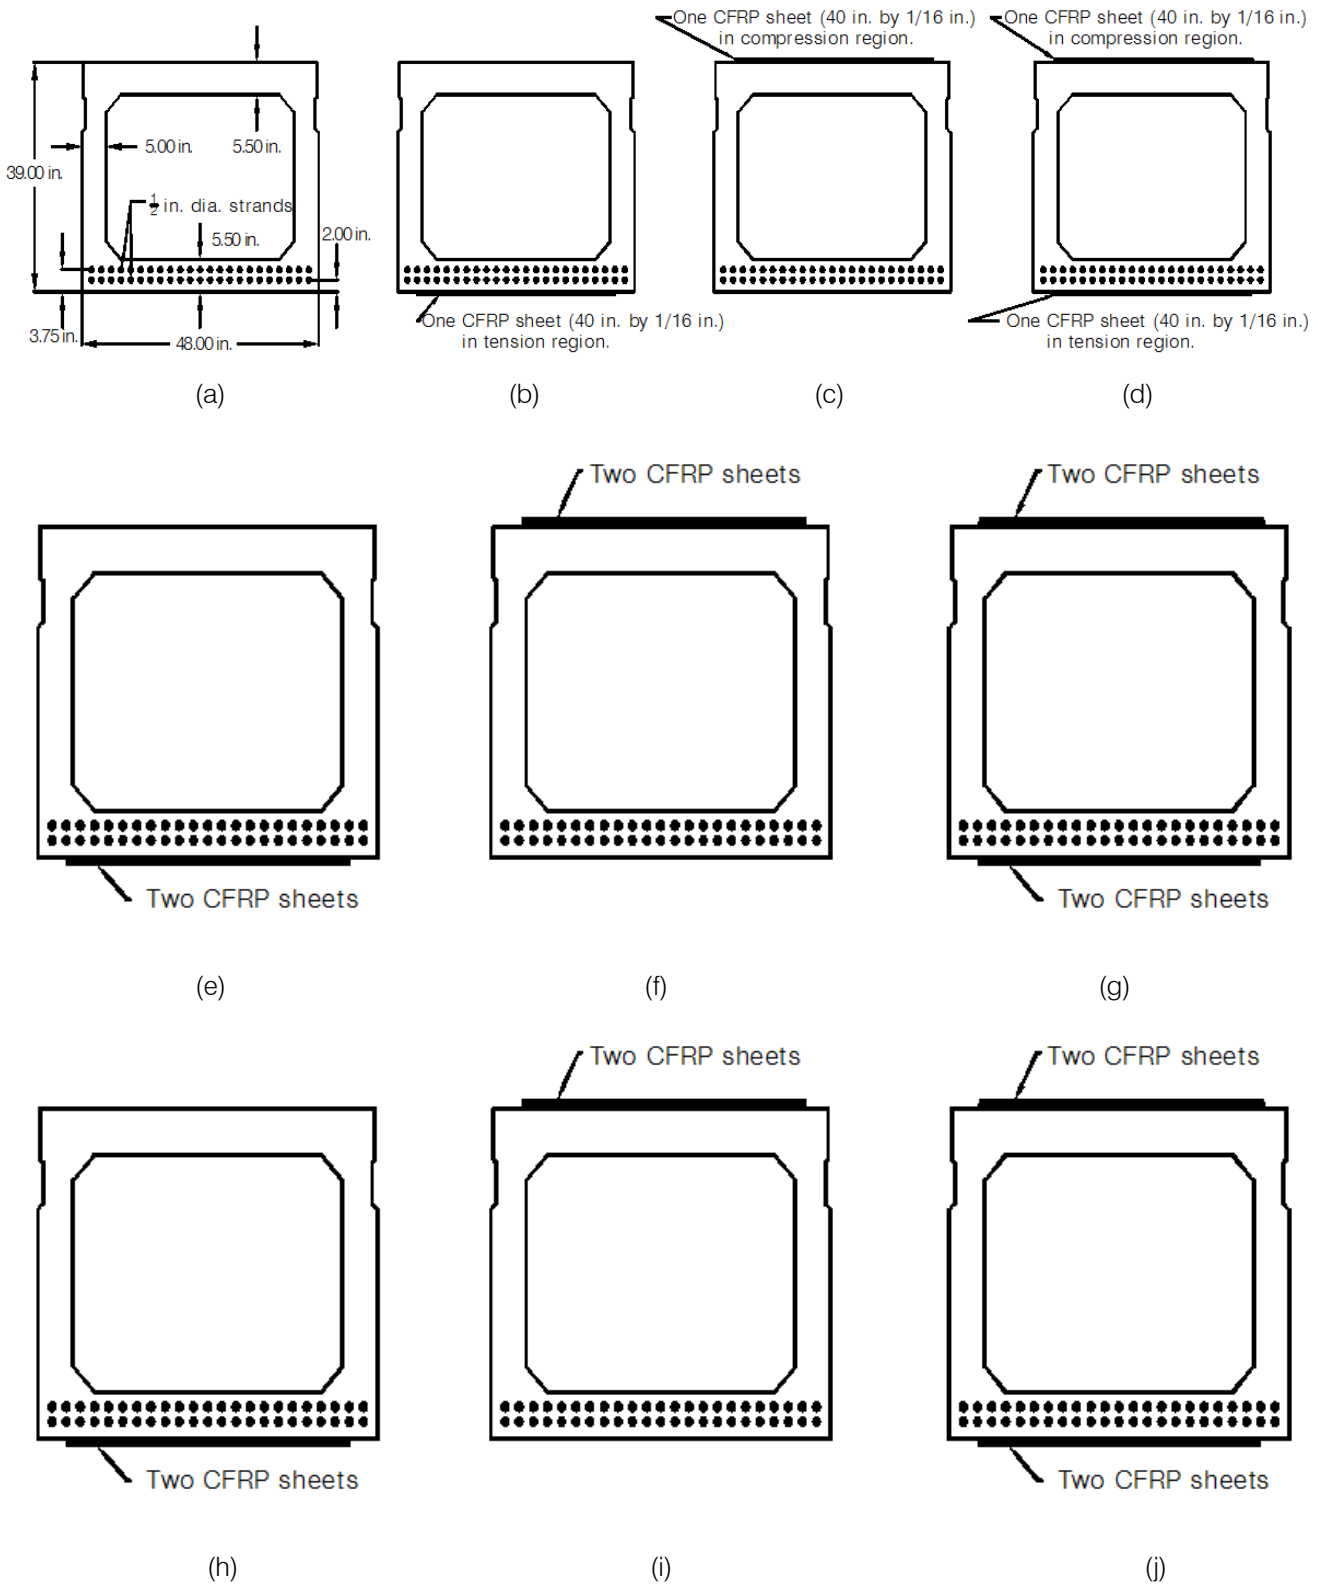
Non-retrofitted box beam section (a), and CFRP retrofitted box beam sections (b) through (j)
